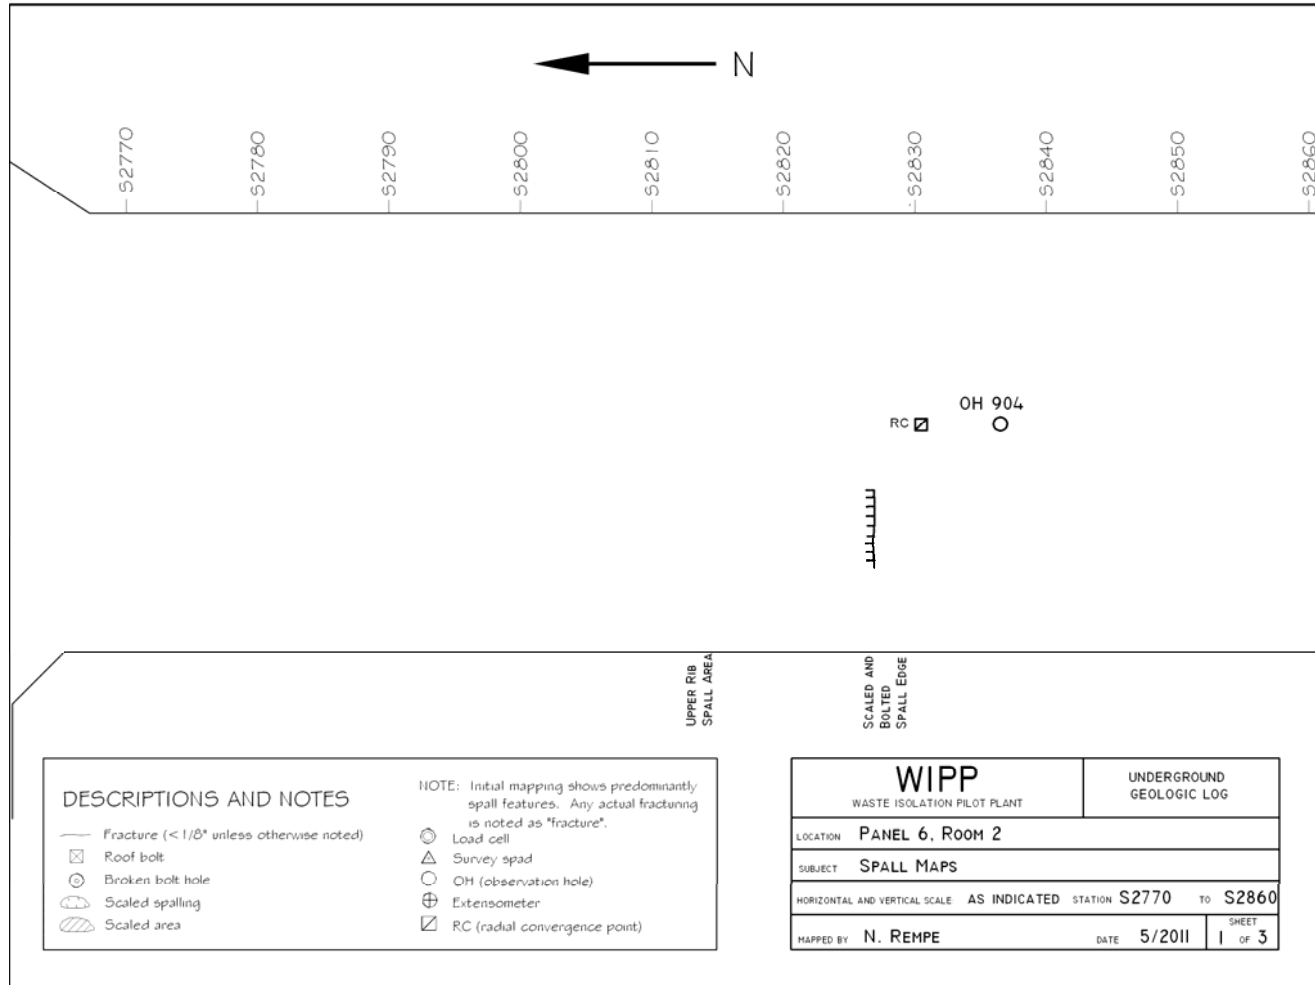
Panel 6 Room 2, S2770-S3060 Roof Fractures (Sheet 1 of 3)
